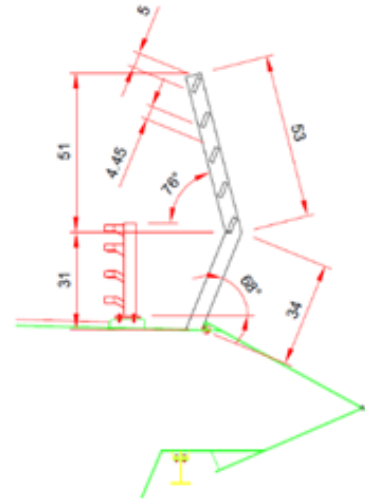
Details of wind shield and guard rail (dimensions in mm)
